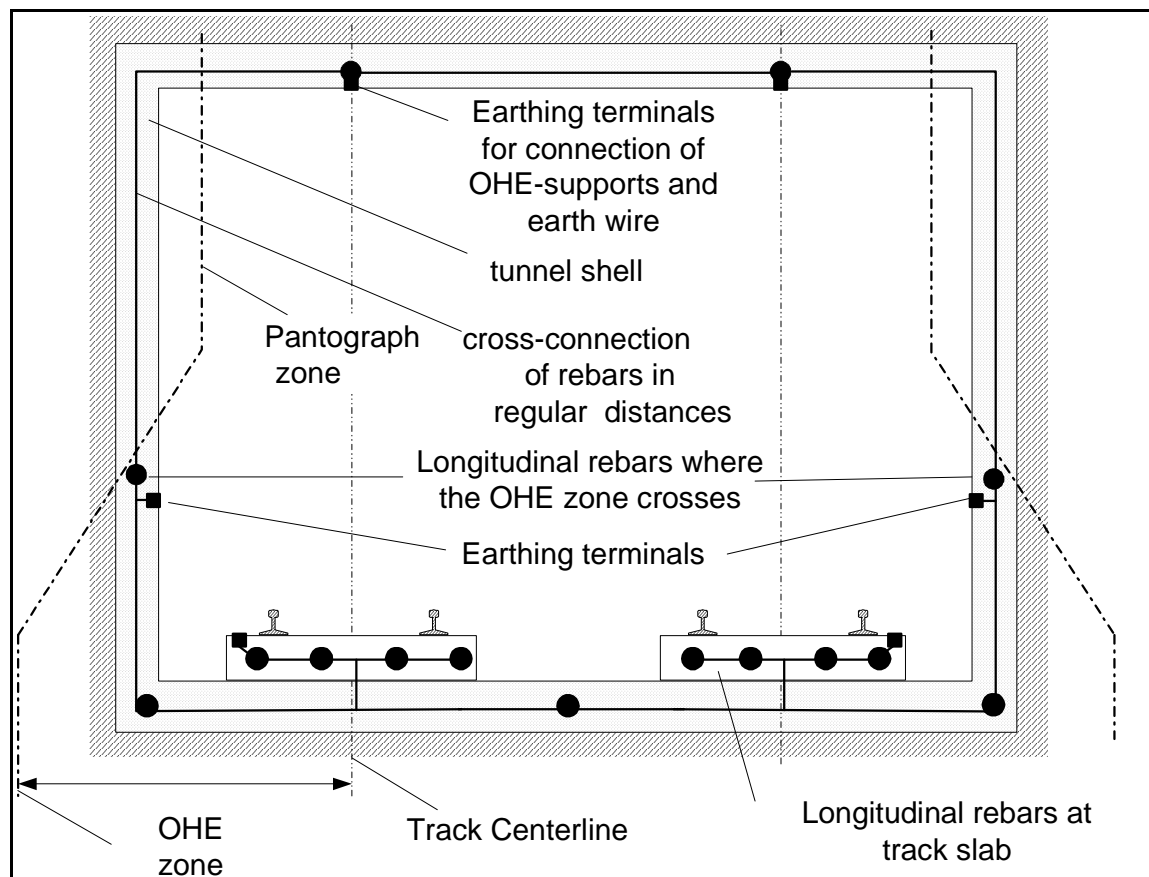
Example of Arrangement of Earth Wires in Tunnels
